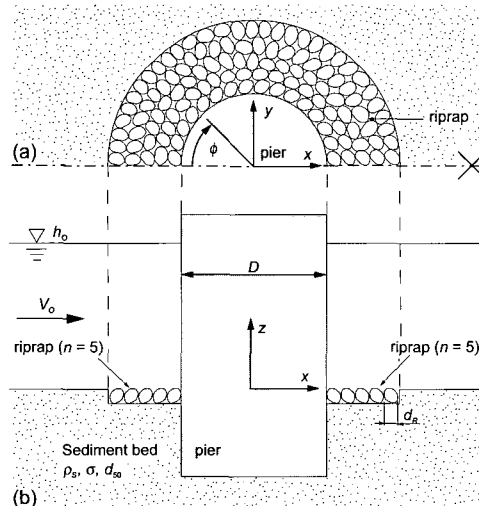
Definition sketch for riprap arrangement (a) Plan, (b) Section
